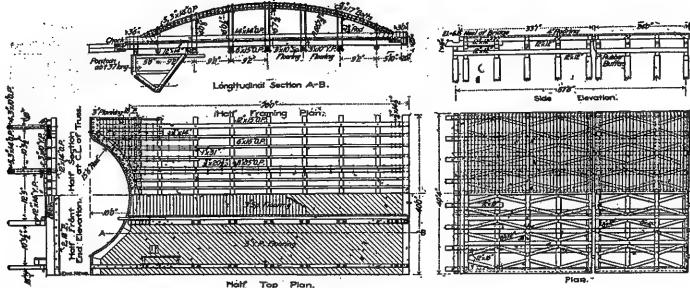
MAIN FERRY BRIDGE AND BUFFER PLATFORMS.
